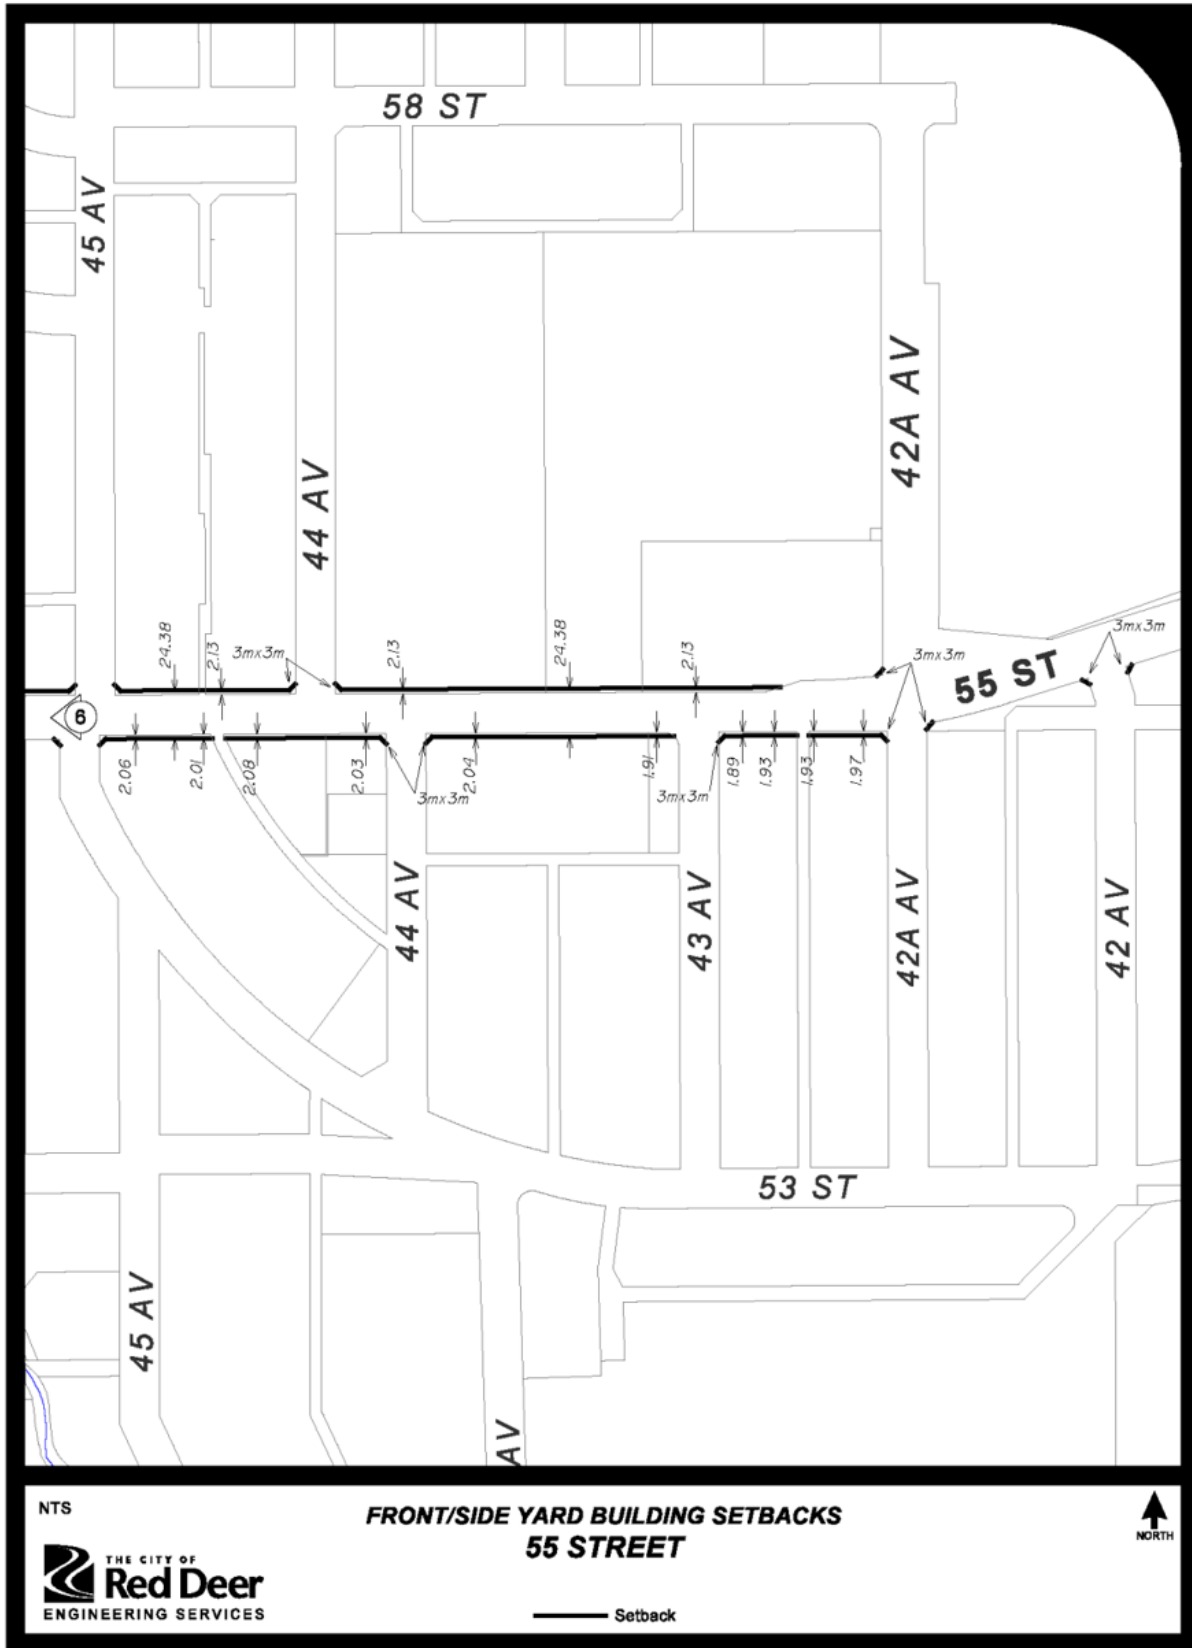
Front and Side Yard Building Setbacks - 55 St (2)
